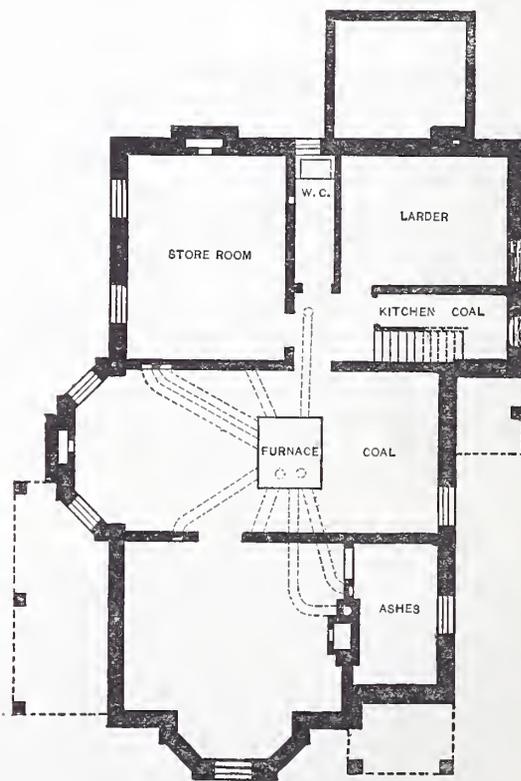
Basement Plan, Submitted by "Myn," No. 92.—Scale, 1-16 Inch to the Foot.
